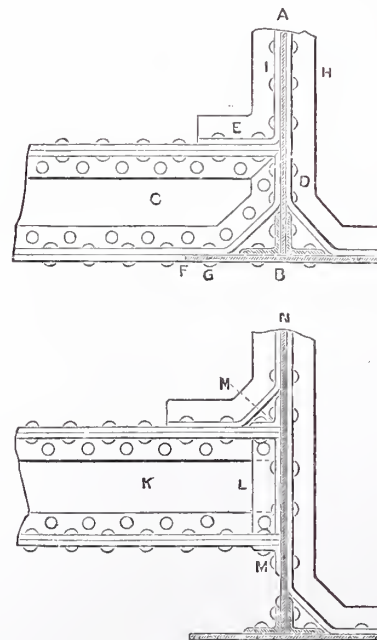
Connection of Cross Girder with Single and Main Girders.
